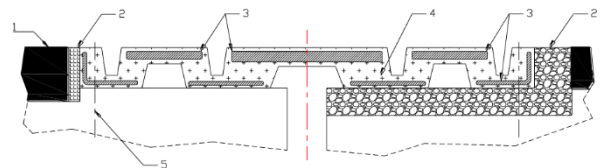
Mat Expansion Joint acc. to ETAG 032-5: 1 – pavement, 2 (left side) – sealant, 2 (right side) – transition strip, 3 – reinforcement, 4 – elastomer, 5 – anchoring.
